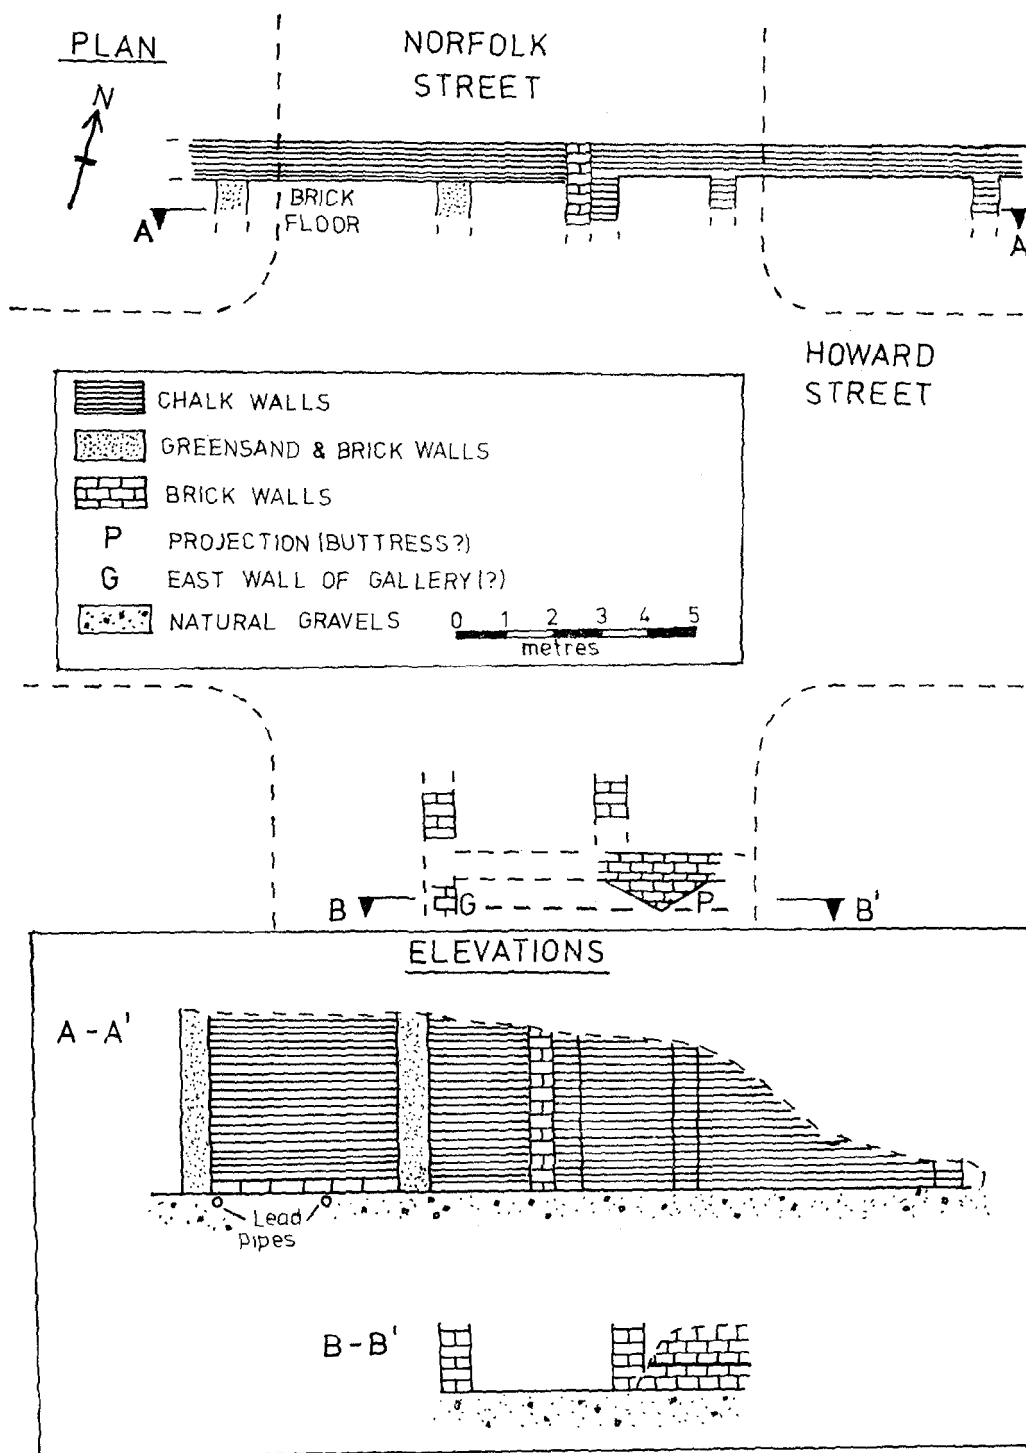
Arundel House. Plan and elevation of structural remains of Great West Wing
